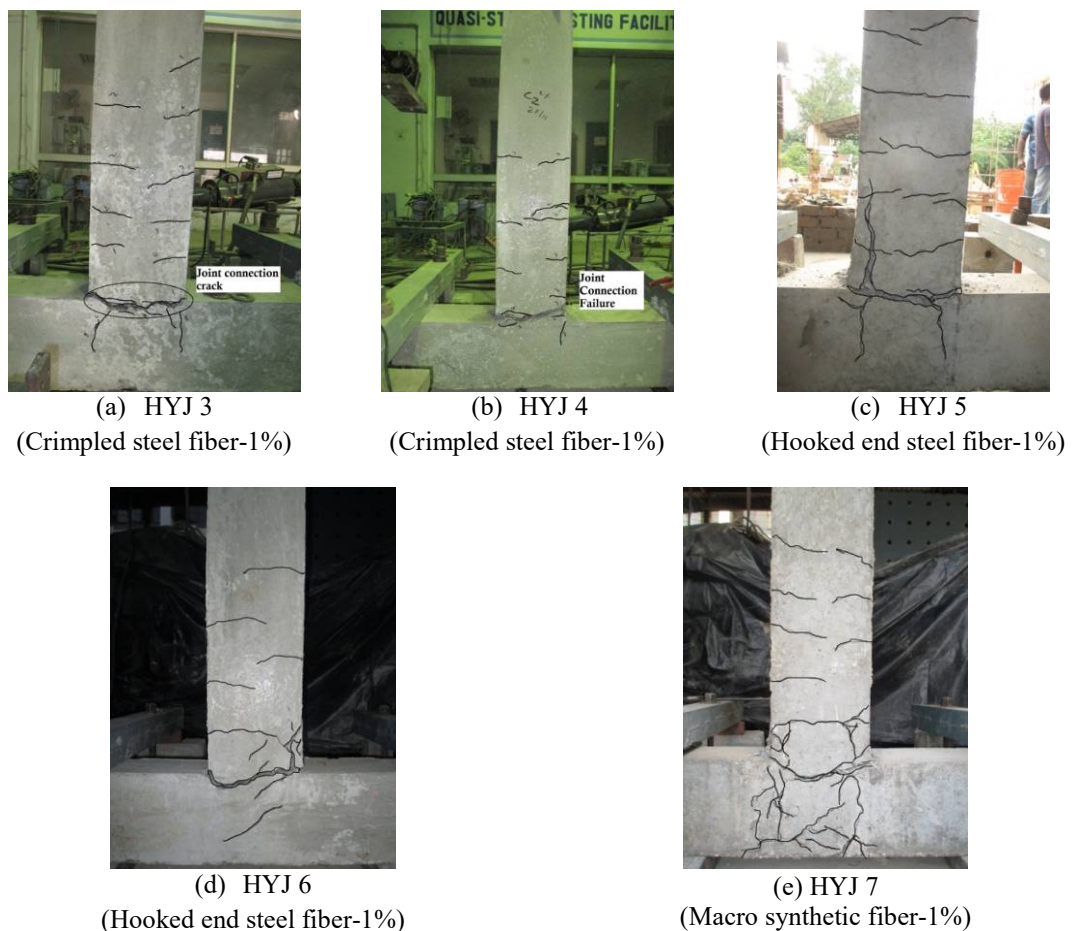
Crack pattern and mode of failure of FRC joint specimens
